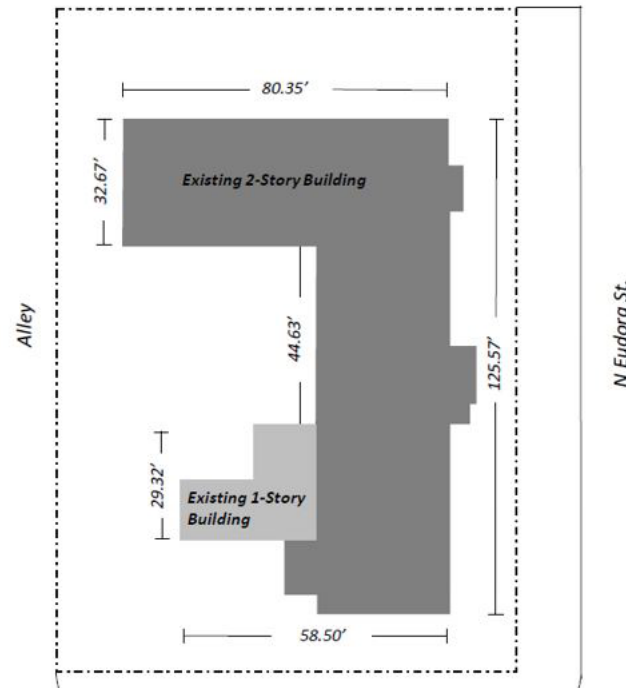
Existing Building Defined within PUD-G 30 (dimensions are approximate)
